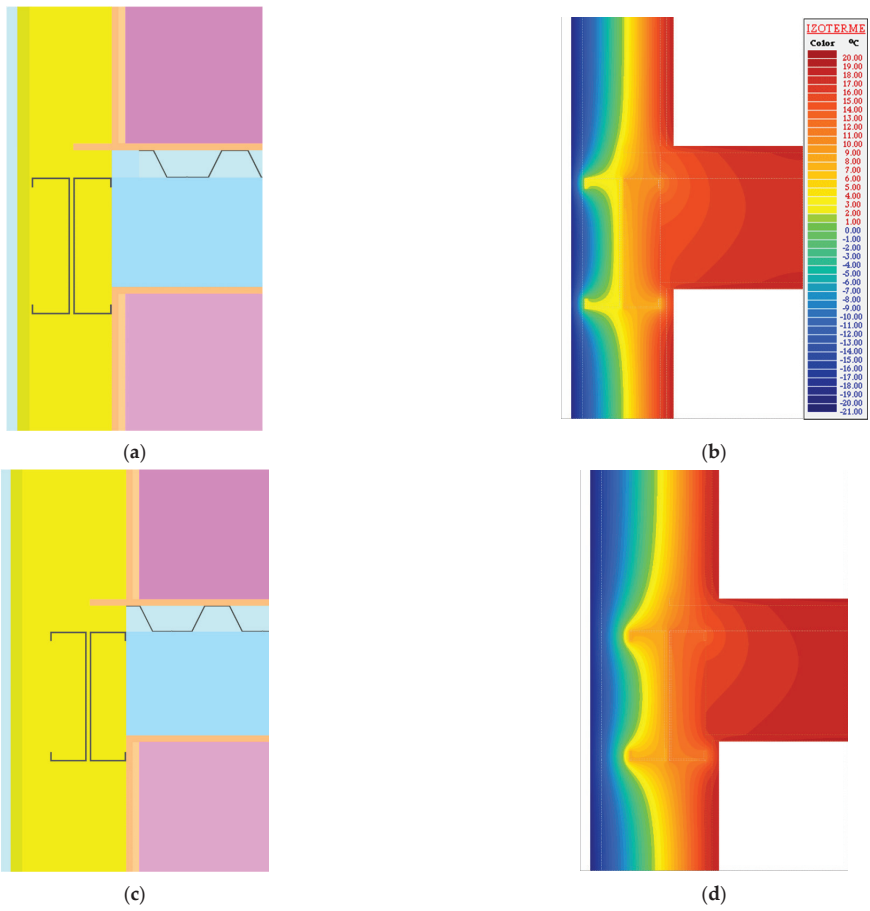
Exterior wall-intermediate floor-Geometrical models (a) E-W wall (c) N wall; Isothermal surfaces (b) E-W wall (d) N wall.
